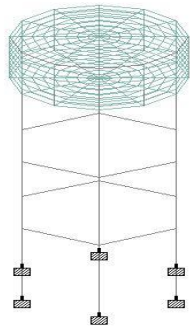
OVERHEAD CIRCULAR TANK DESIGN
